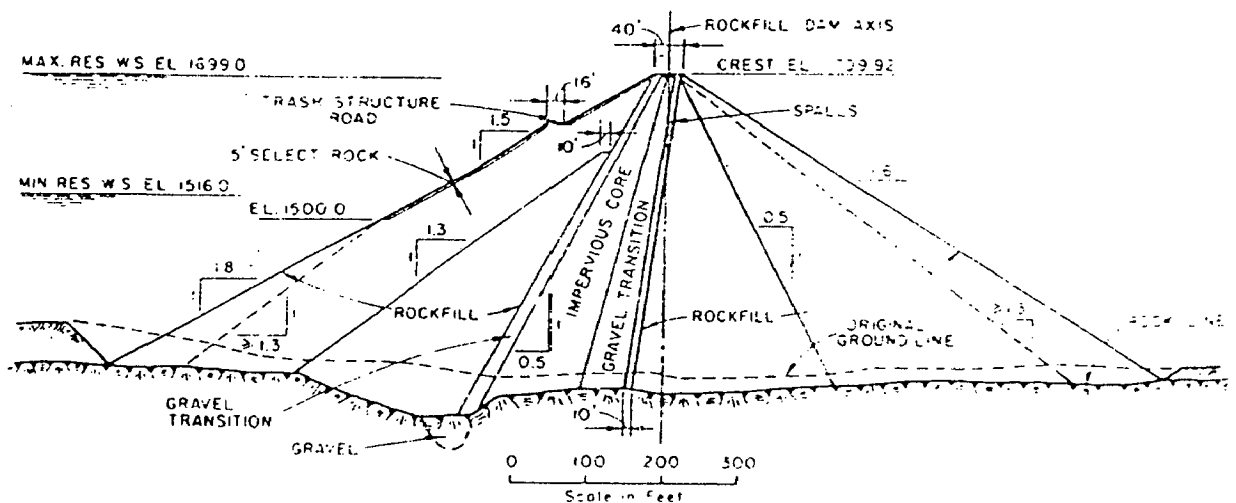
The typical cross section of the Cougar Dam, USA.
